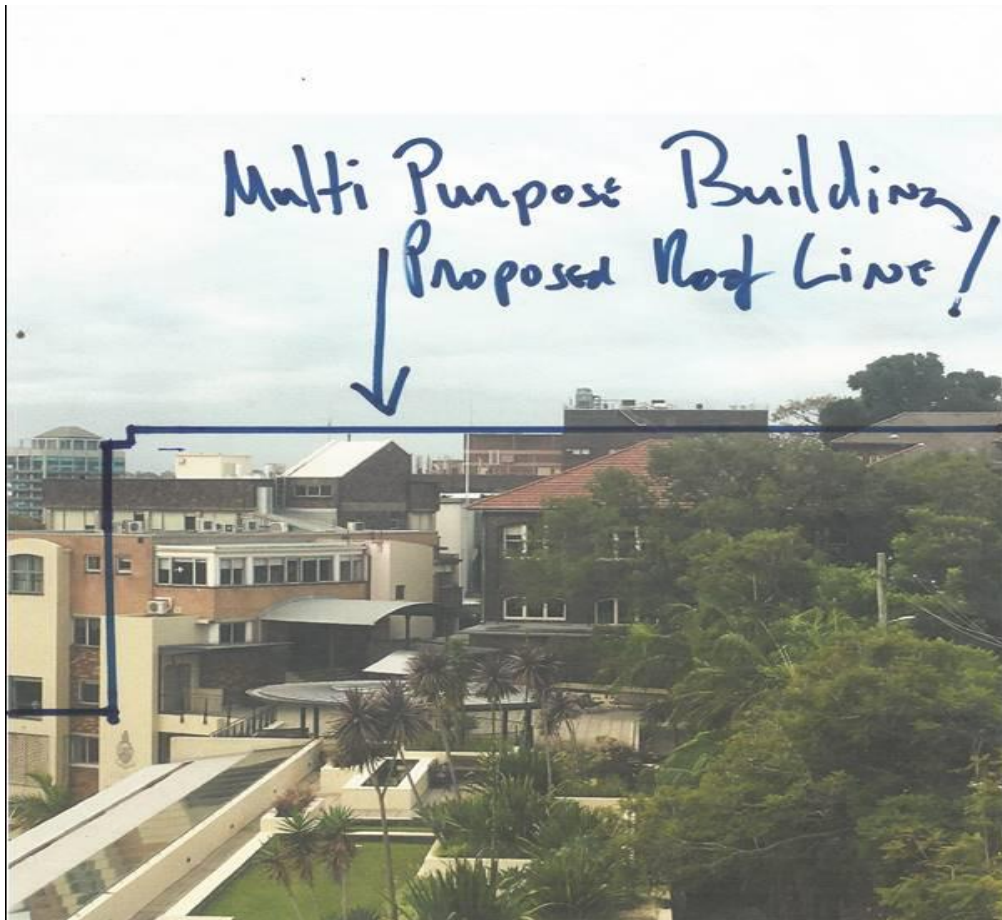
Looking at proposed MPB outline from Cnr of Shorter Lane and Thomson St
